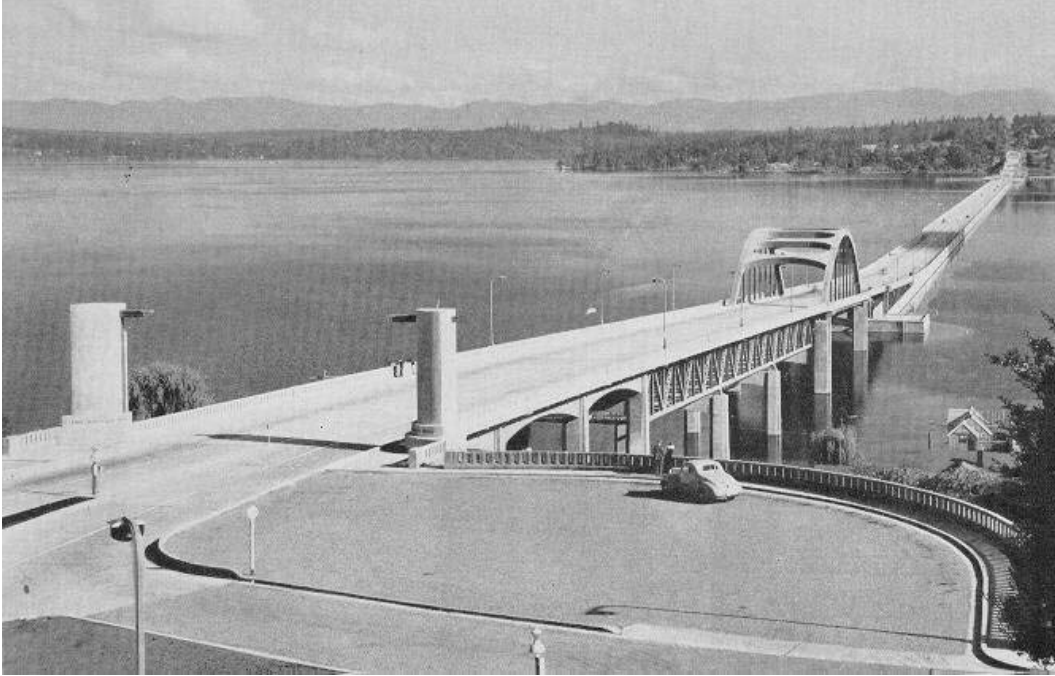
Original Lacey V. Murrow Bridge, Looking East Toward Mercer Island
